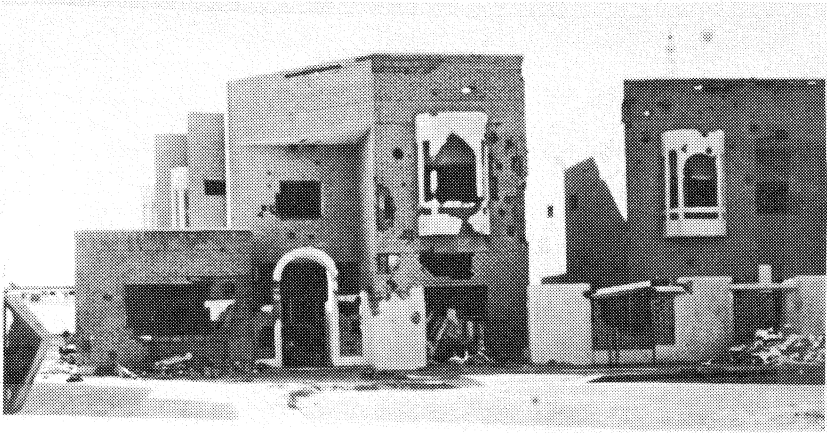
House where Cladding System sustained Shelling Damage
